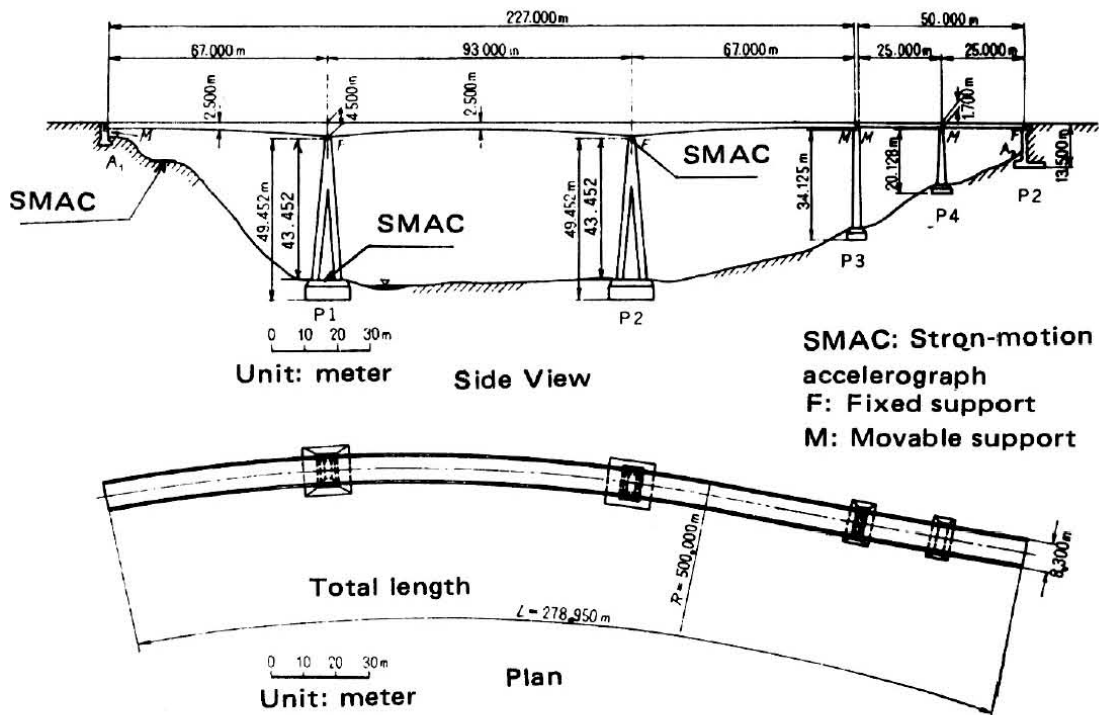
Elevation and Plan Drawings for Yoneyama Bridge (Iwasaki, 1972).
